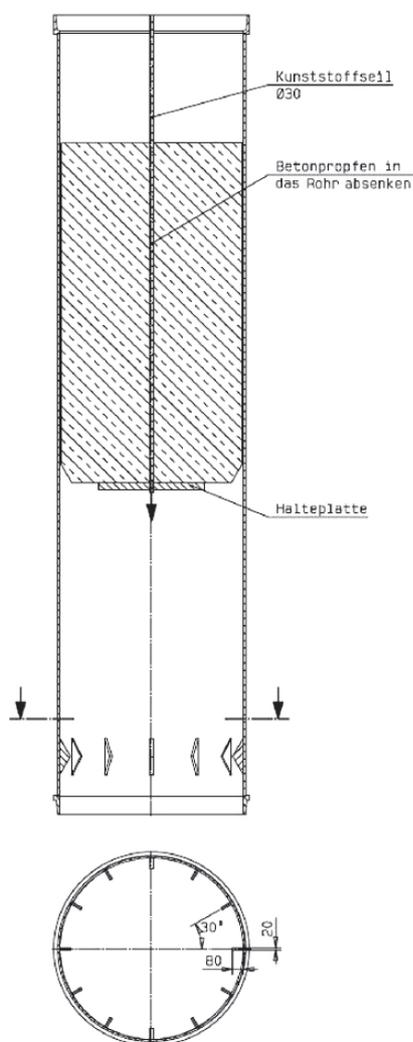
Standpipe with bearing surface and concrete seal. // Bild 9. Standrohr mit Auflagefläche und Betonverschluss. Source/Quelle: RAG
